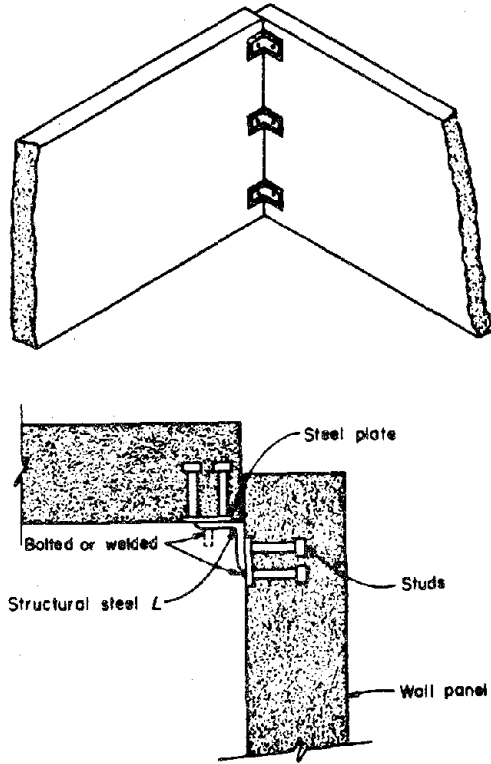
TYPICAL "DRY" VERTICAL CONNECTION [32]
